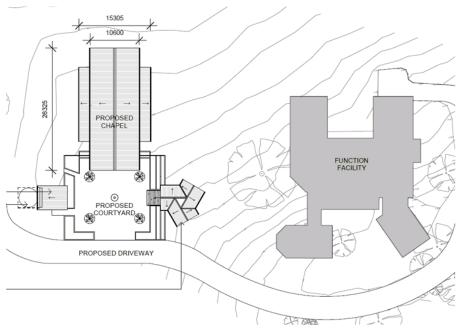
Site Plan Illustrating Proposed New Chapel Building
